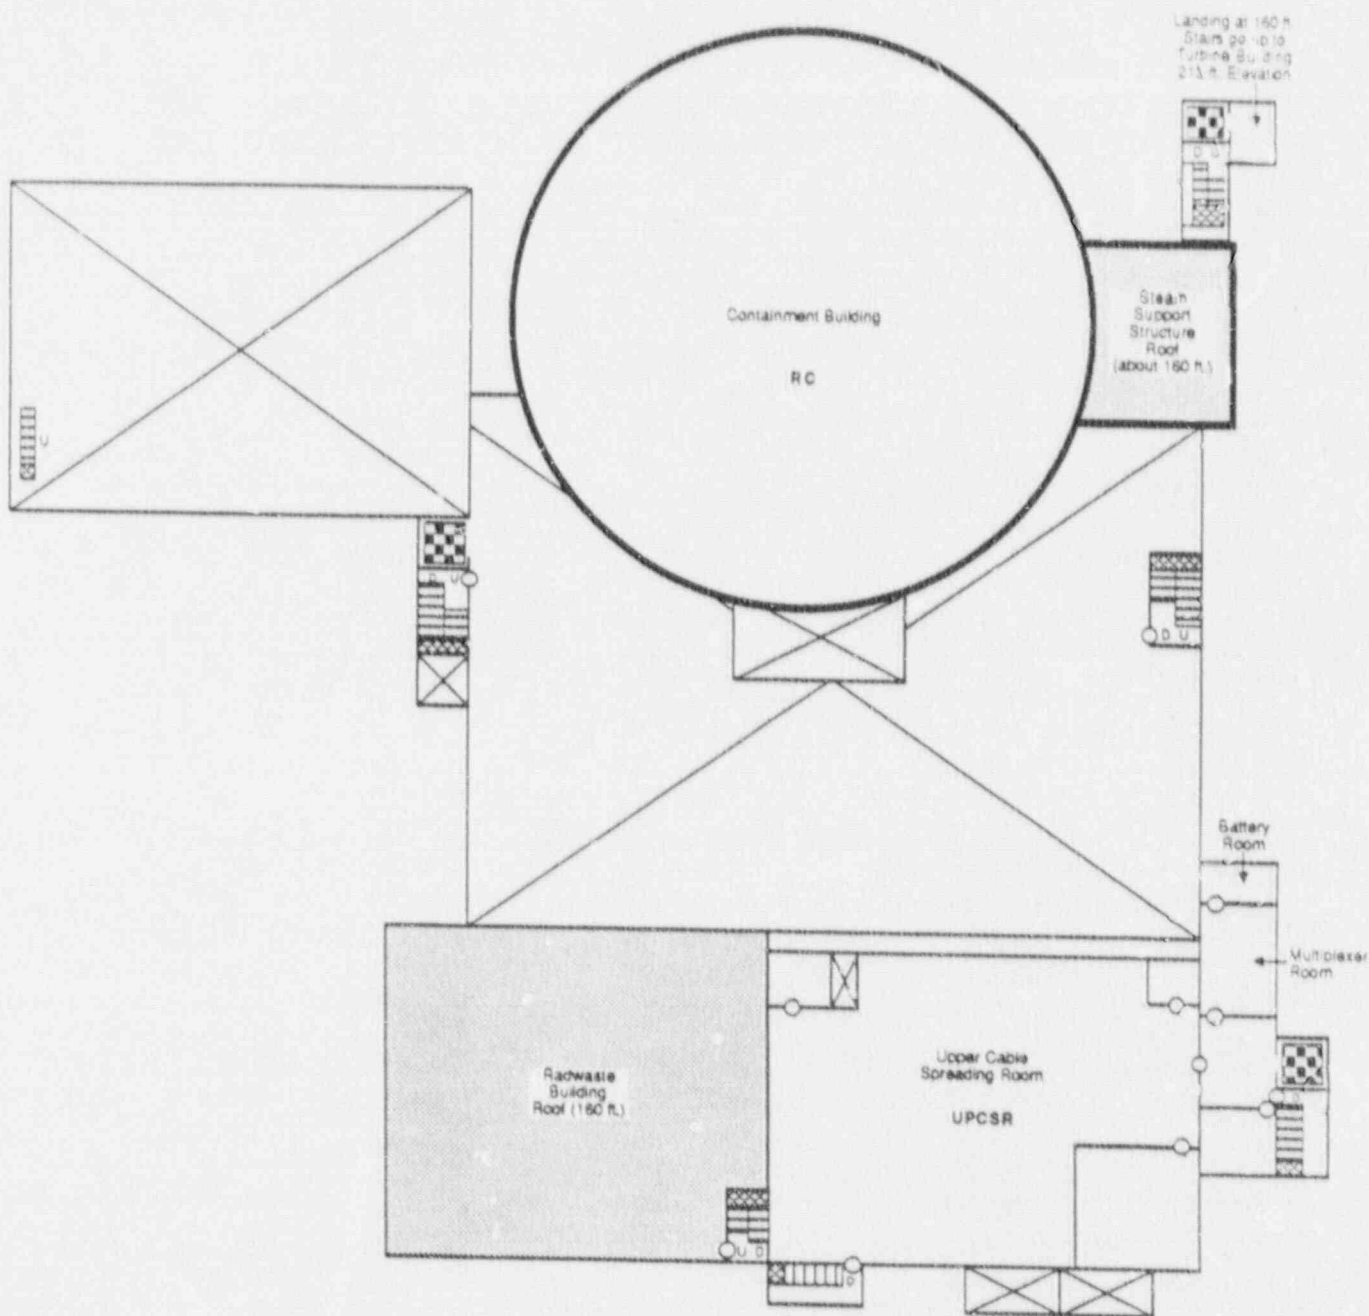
Palo Verde Power Block (Except Turbine Building), 160 ft. Elevation
